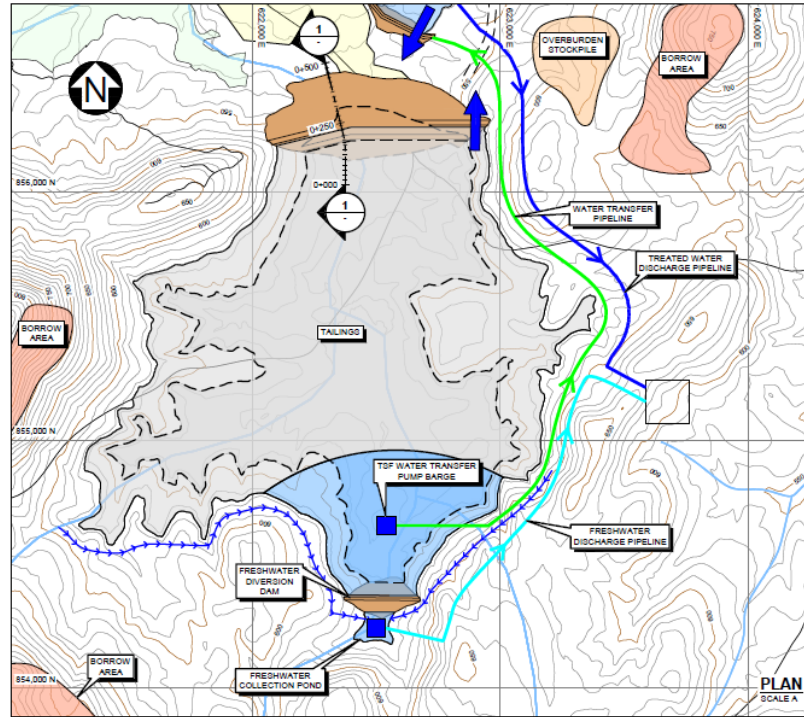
TSF Plan and Section (Horsfield and Muir, 2024b)
